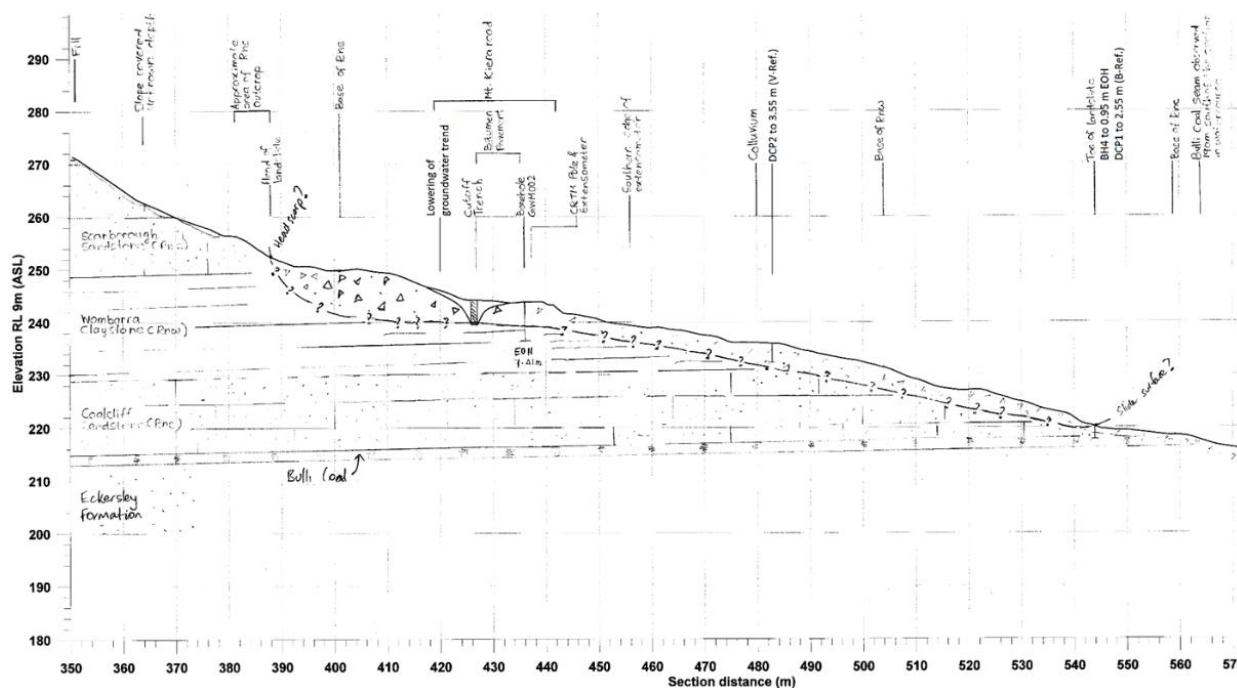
Site 229 cross-section developed by Flentje, Palamakumbure, Piatek and the Newman (Piatek, 2016)
